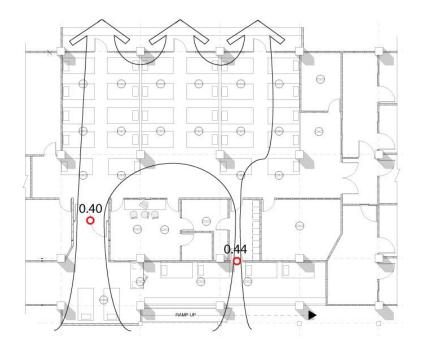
Floor plan and ventilation data of hospital A inpatient ward
